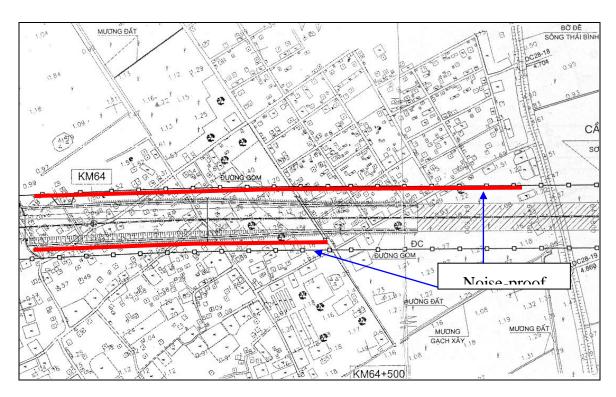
Location of noise-proof wall in the section passing through Vuc village
